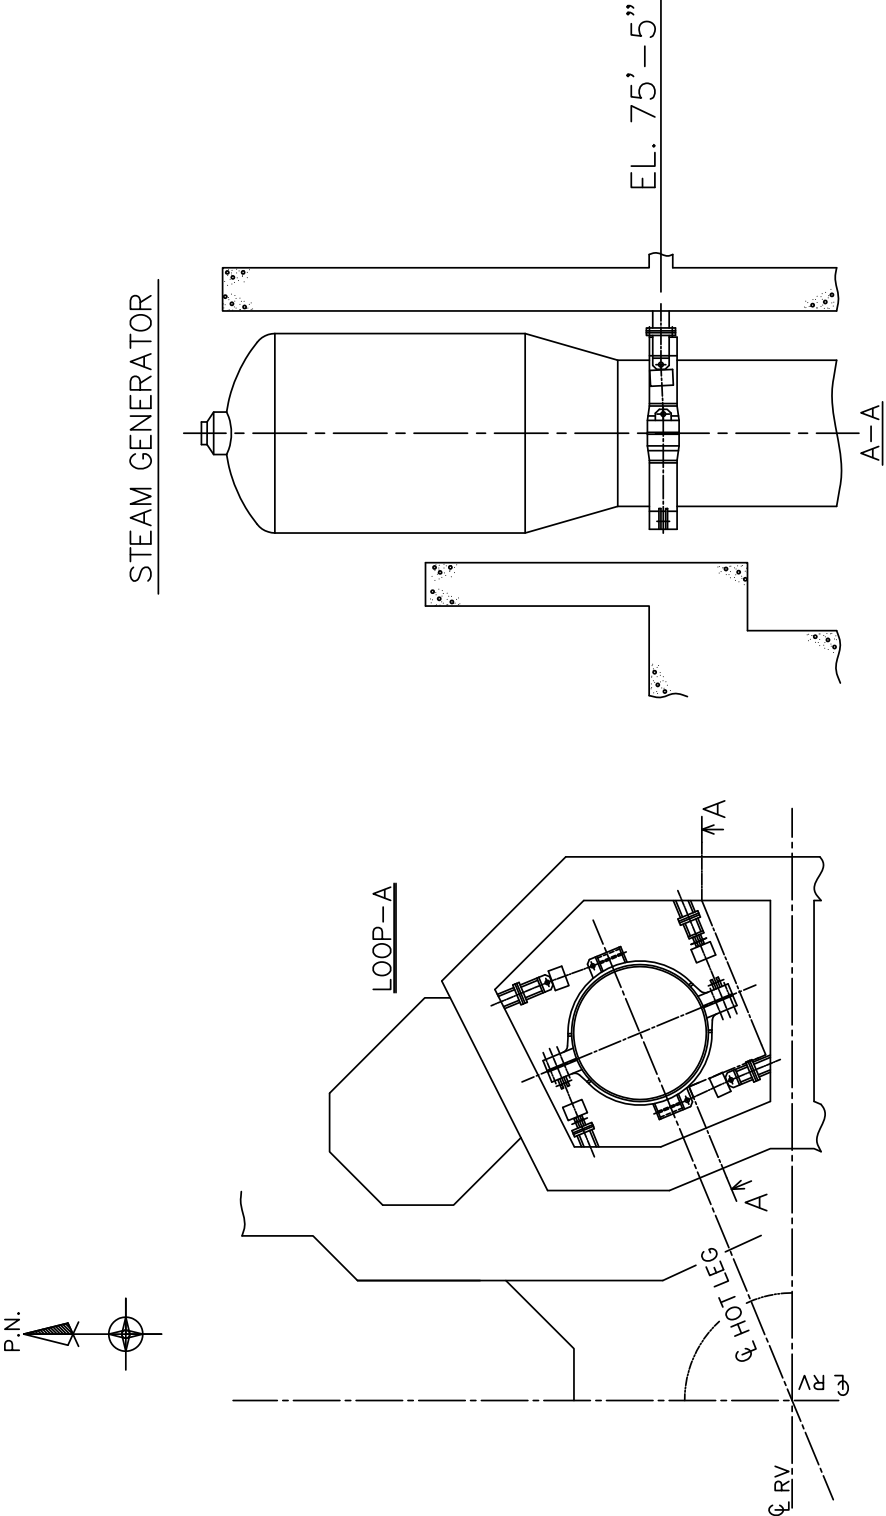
SG Support System (Sheet 2 of 4)
